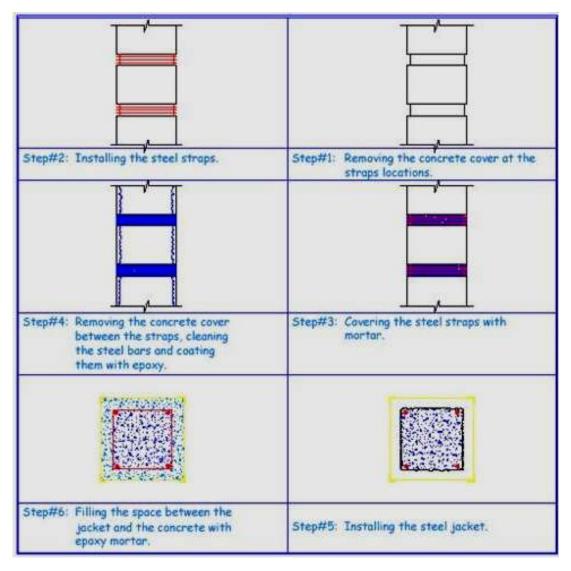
Increasing the cross-sectional area of column by steel jacketing.
